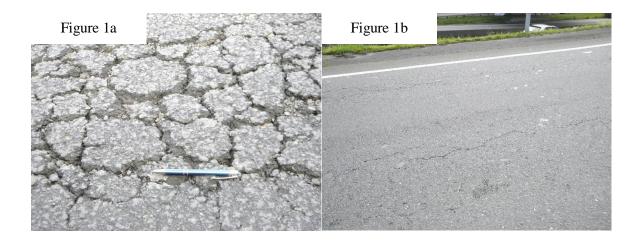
Cracking due to HMA fatigue: a) "Alligator" cracking and b) Longitudinal cracks along the wheel pad.
